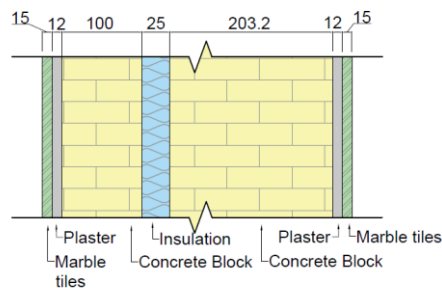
M3 external wall cross-sectional detail. All dimensions are in millimetres.
